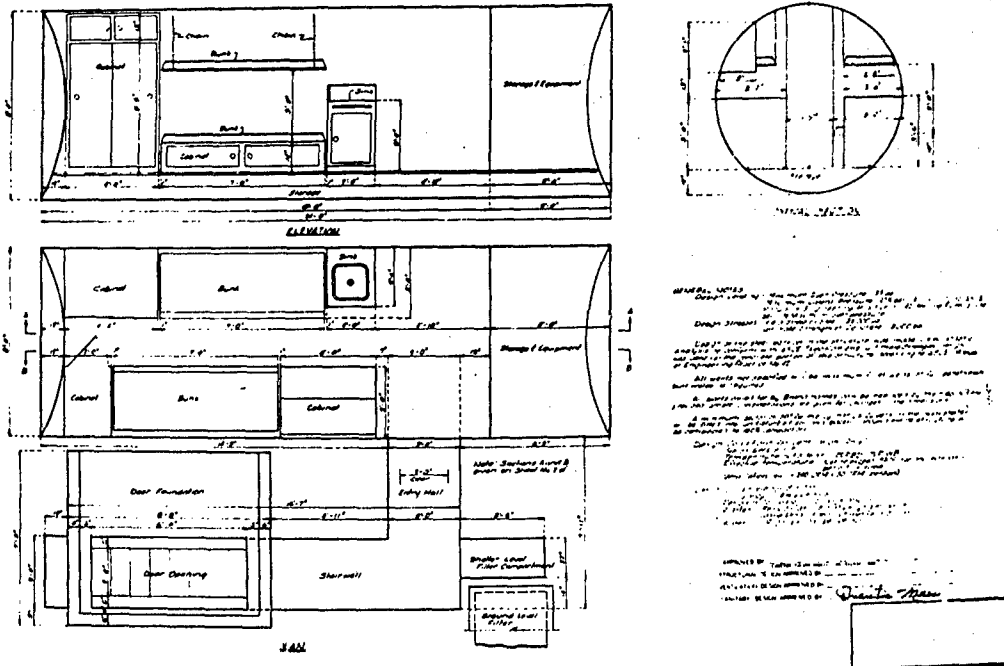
Plan and Elevation Details For a Culvert-Type Shelter
